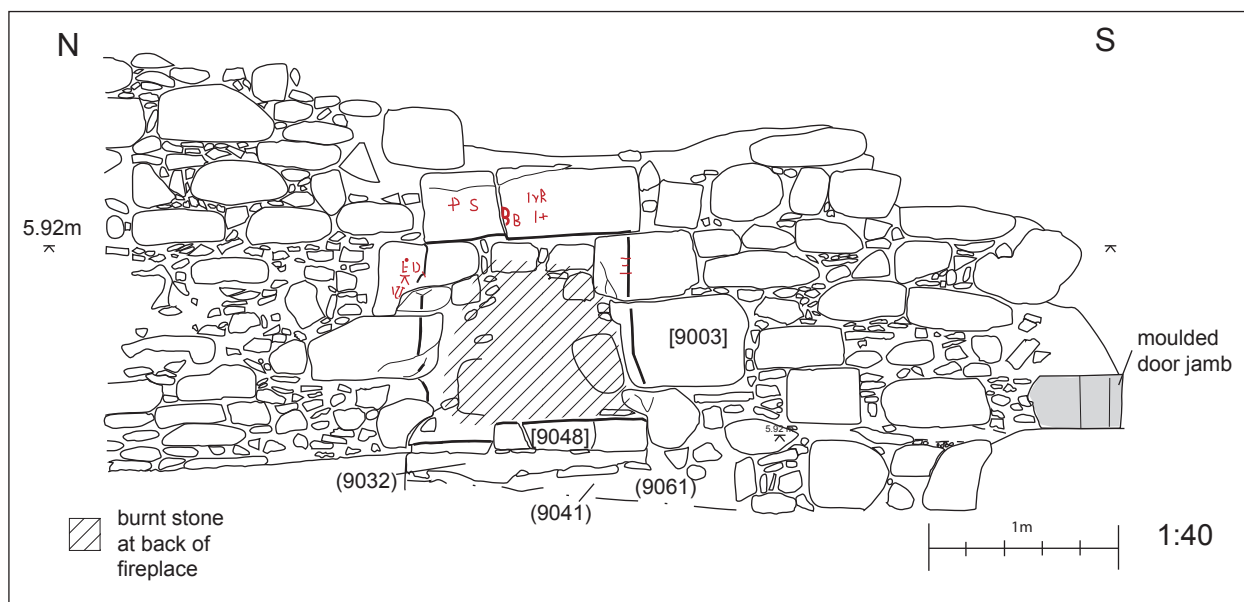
Elevation of west facing dividing wall [9003] showing fireplace and carved symbols
